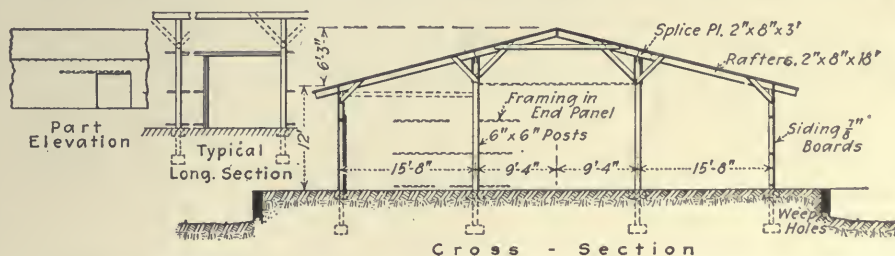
CROSS-SECTION OF WOODEN WAREHOUSE AT BASE STORAGE PLANT
